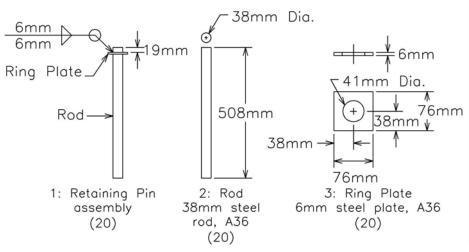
Steel H-section Temporary Barrier Splice Details (Design No. 2)
